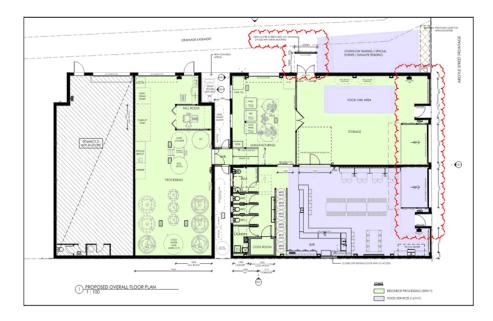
Proposed floor plan detailing resource processing uses (highlighted in green) and food servicing uses (highlighted in lilac).
